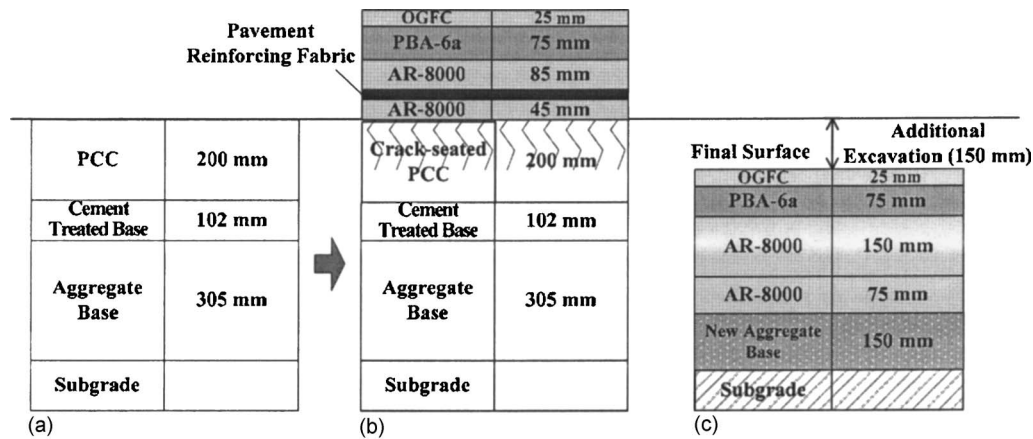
Typical pavement cross-section changes: (a) existing pavement; (b) CSOL [crack, seat, and AC overlay (230 mm)]; and (c) FDAC (full-depth AC replacement (325 mm))
